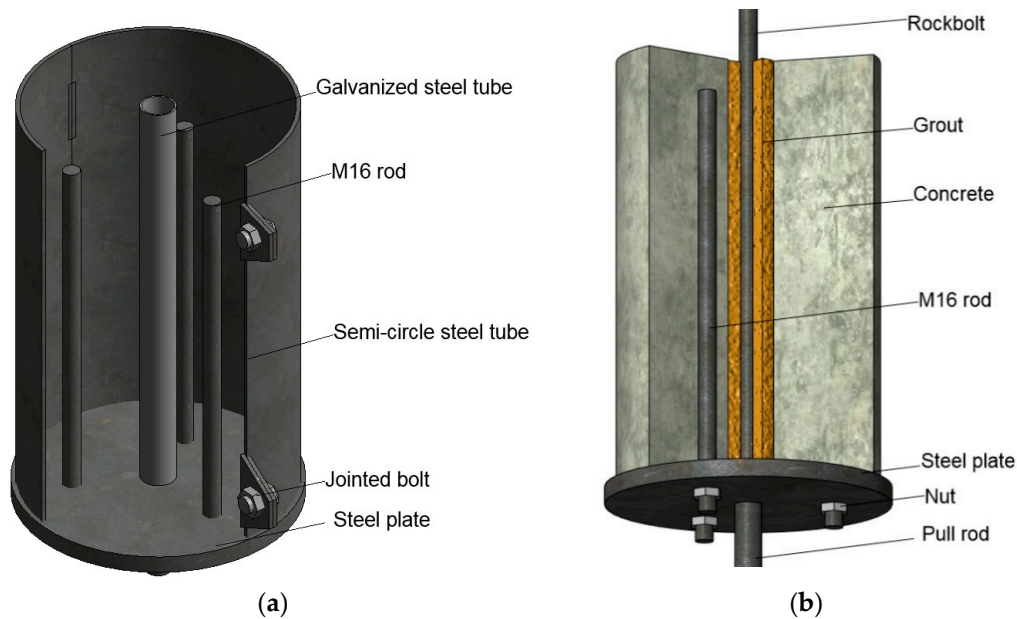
(a) The mold used for casting the concrete and (b) the testing sample after pouring.
